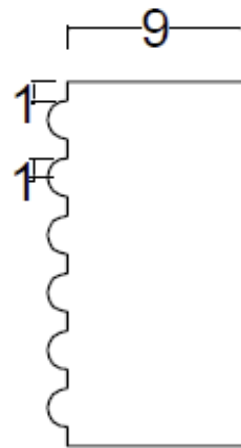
shows the cross section of the spandrel. Figure 4 shows a detail of the 10 inch width of the stem which consists of 9 inches of solid section and 1 inch of grooved exterior. The longitudinal reinforcement in the section consists of 28 prestressing strands: seven one-half inch prestressing strands and 21 one-quarter inch strands. There was no conventional longitudinal reinforcing steel. At the mid-span of the beam, where the crack occurred, there are number 4 bar vertical stirrups at twelve inch spacing.
